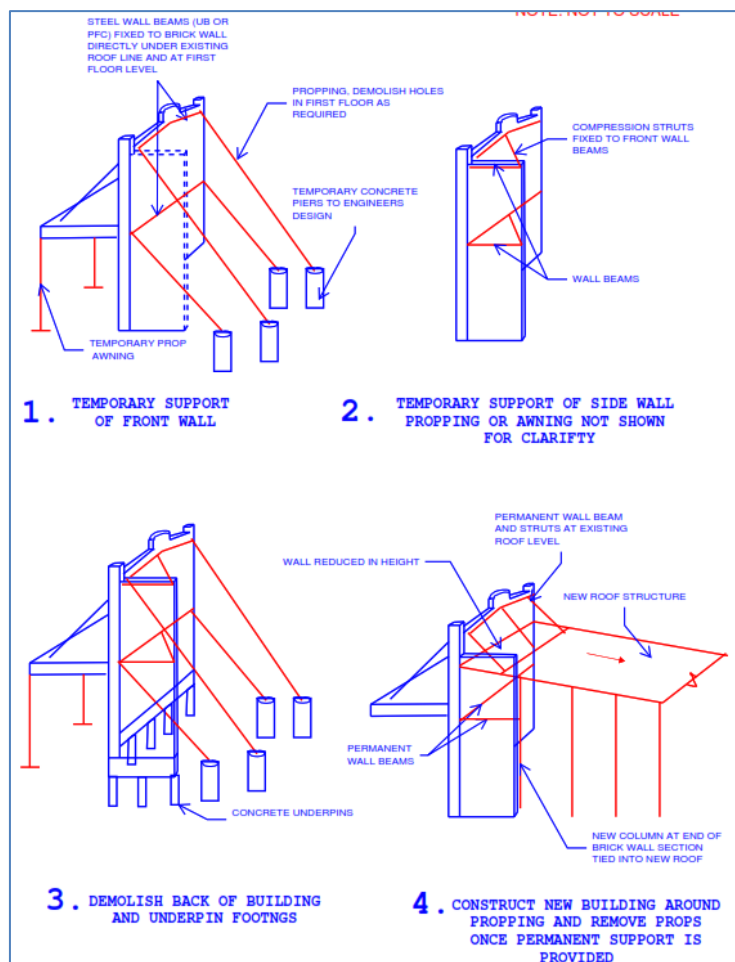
high-level methodology and concept sketch for supporting the brick façade during demolition and construction
